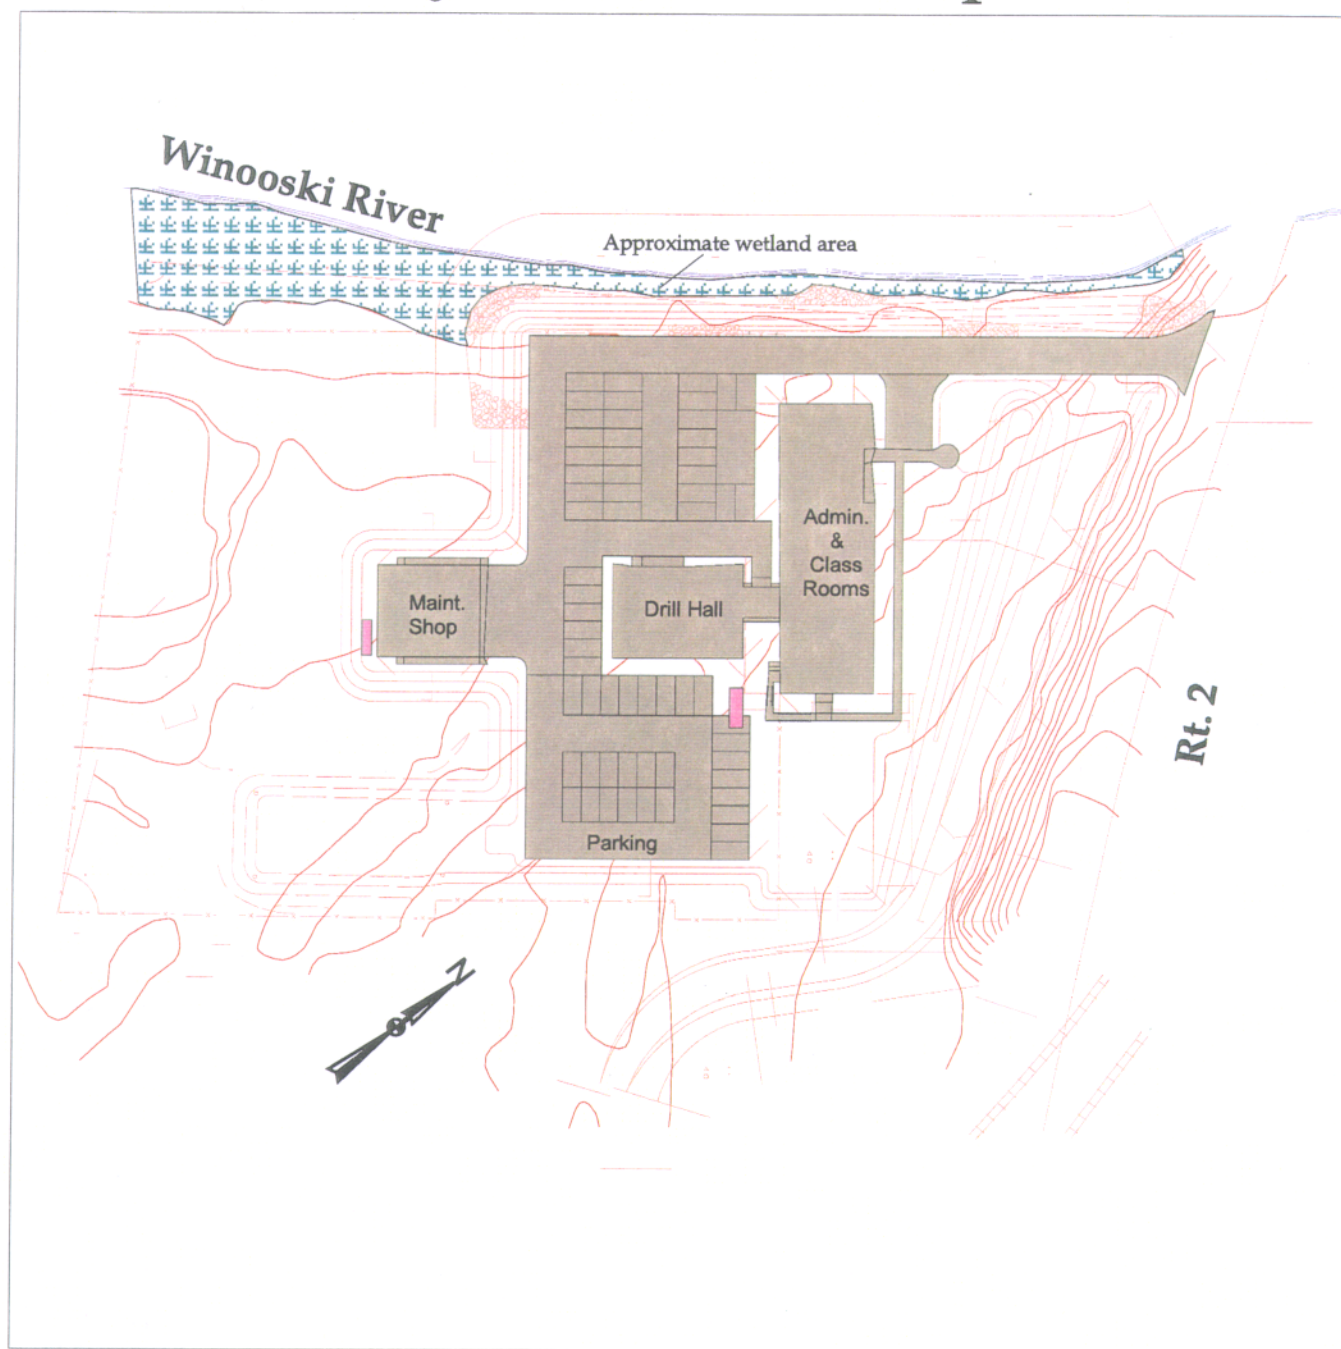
Site Plan Detail Conti-Tracy USARC, Montpelier VT
